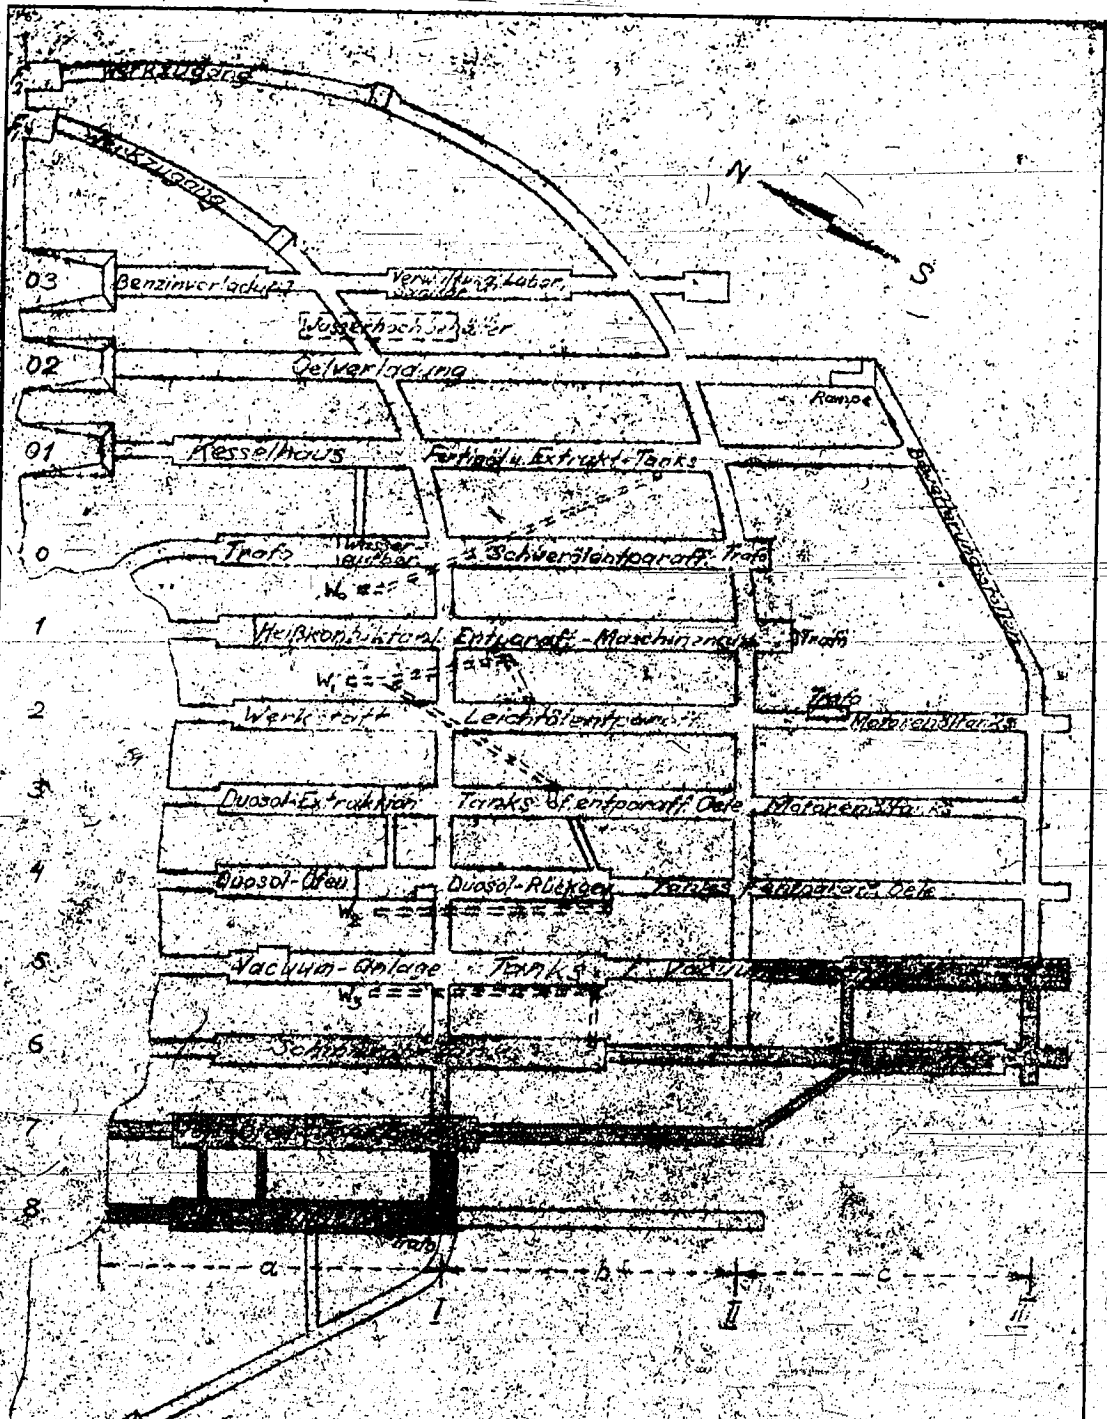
Plan (Scale 1:2000) showing layout of Underground Refinery at Ebensee, Austria.
